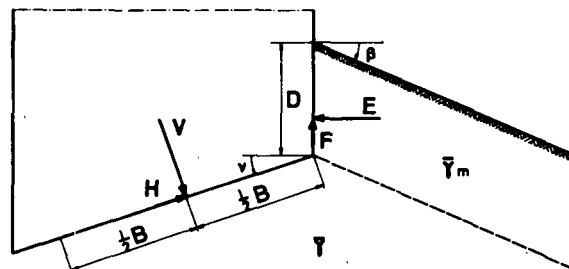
General case of base and front of retaining wall with inclination of base and ground.
